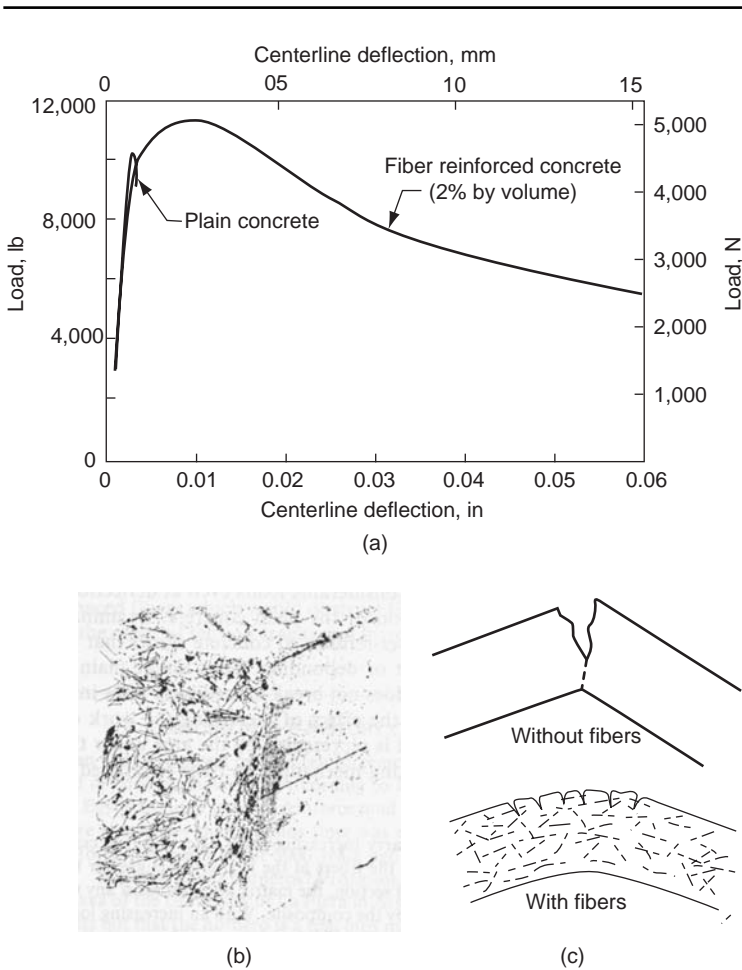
(a) Load-deflection behavior of plain and fiber-reinforced concrete; (b) cross-section of a steel-fiber-reinforced beam after fracture showing that the failure mode is fiber pullout; (c) mechanism of increase in flexure toughness of concrete with fibers. [(a) From Hanna, A.C., Report RD049.01P, Portland Cement Association, Skokie, IL, 1977; (b) From Krenchel, H., *Fiber Reinforced Concrete*, ACI SP-44, pp. 45–77, 1974; (c) From Johnson, C.D., in *Progress in Concrete Technology*, Malhotra, V.M., ed., CANMET, Ottawa, 1980.]
